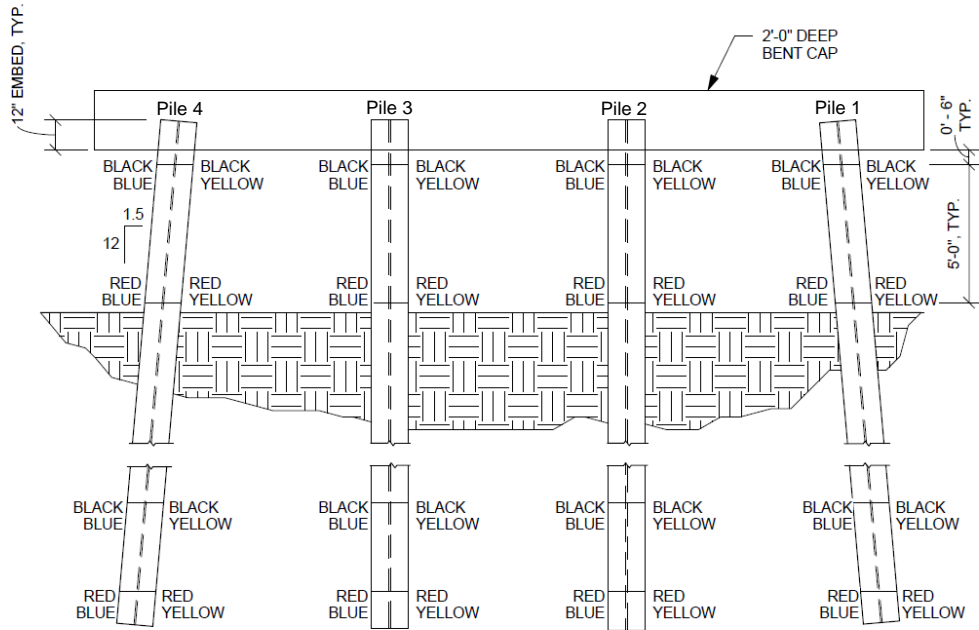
Steel Pile Instrumentation Layout Facing Old Town Creek
